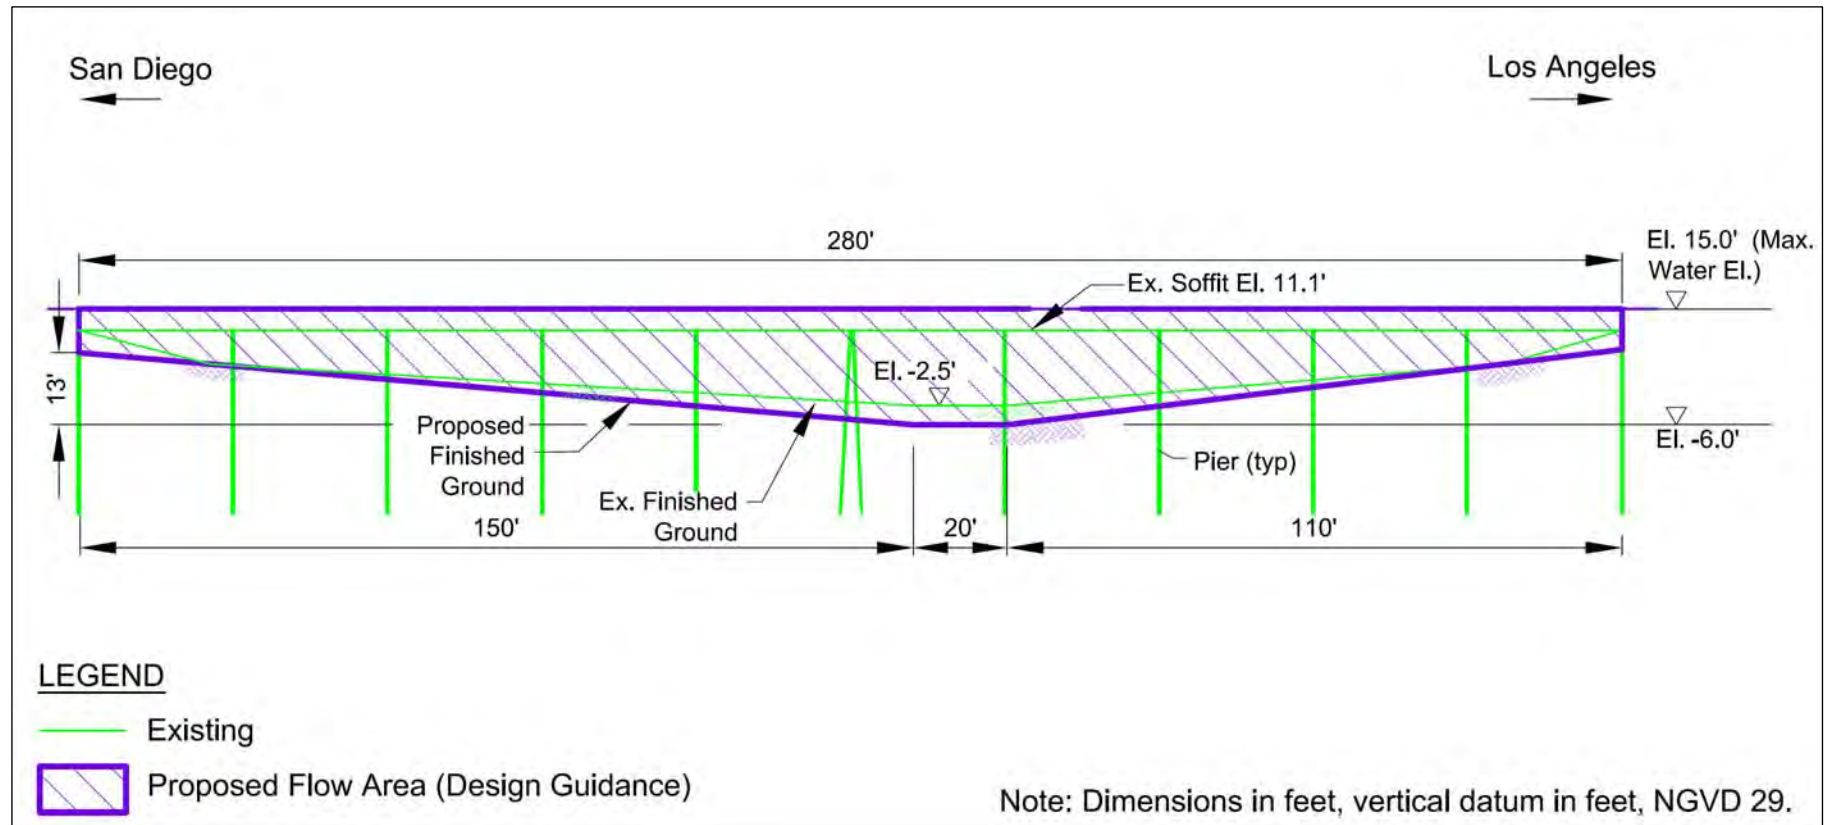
Design Guidance for Channel Cross Section of Railroad Bridge at Buena Vista Lagoon
